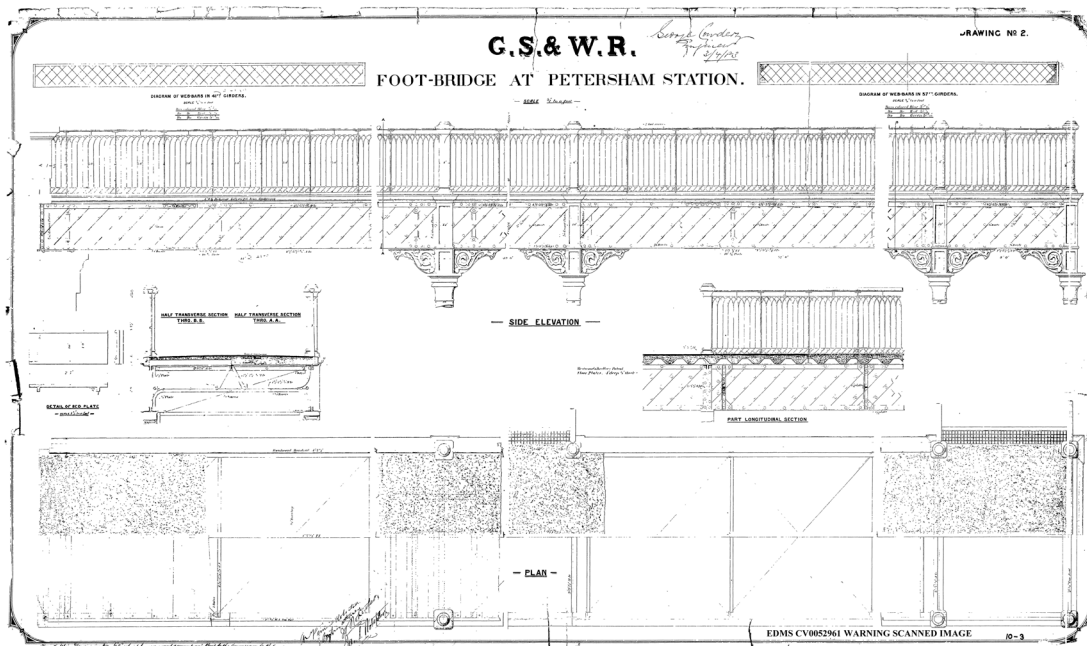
Footbridge at Petersham Station plan 1883. Source: TfNSW
